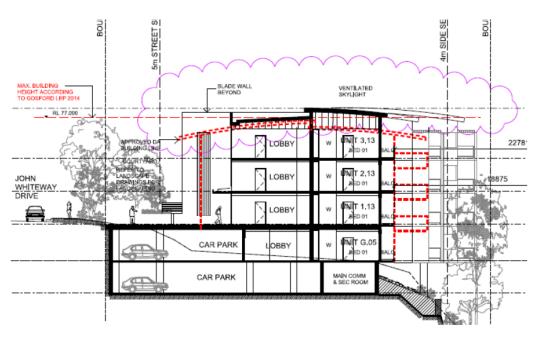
Section 2 of the submitted plans showing height of lowered part of building
